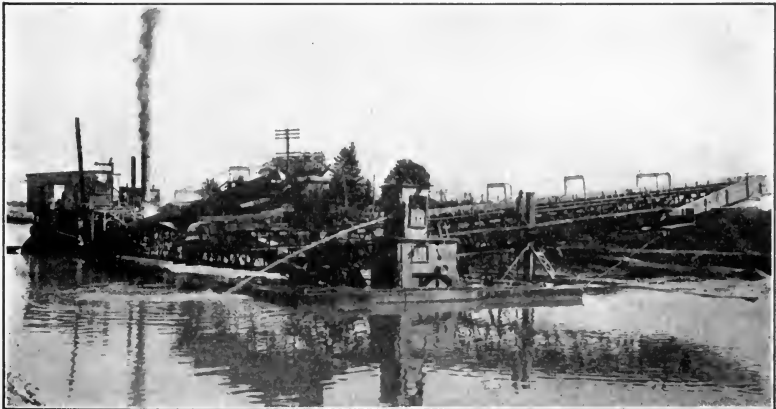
View of elevator end of steel pontoon dredge operating on New York State barge canal. (Courtesy of N. Y. State Engineer.)
